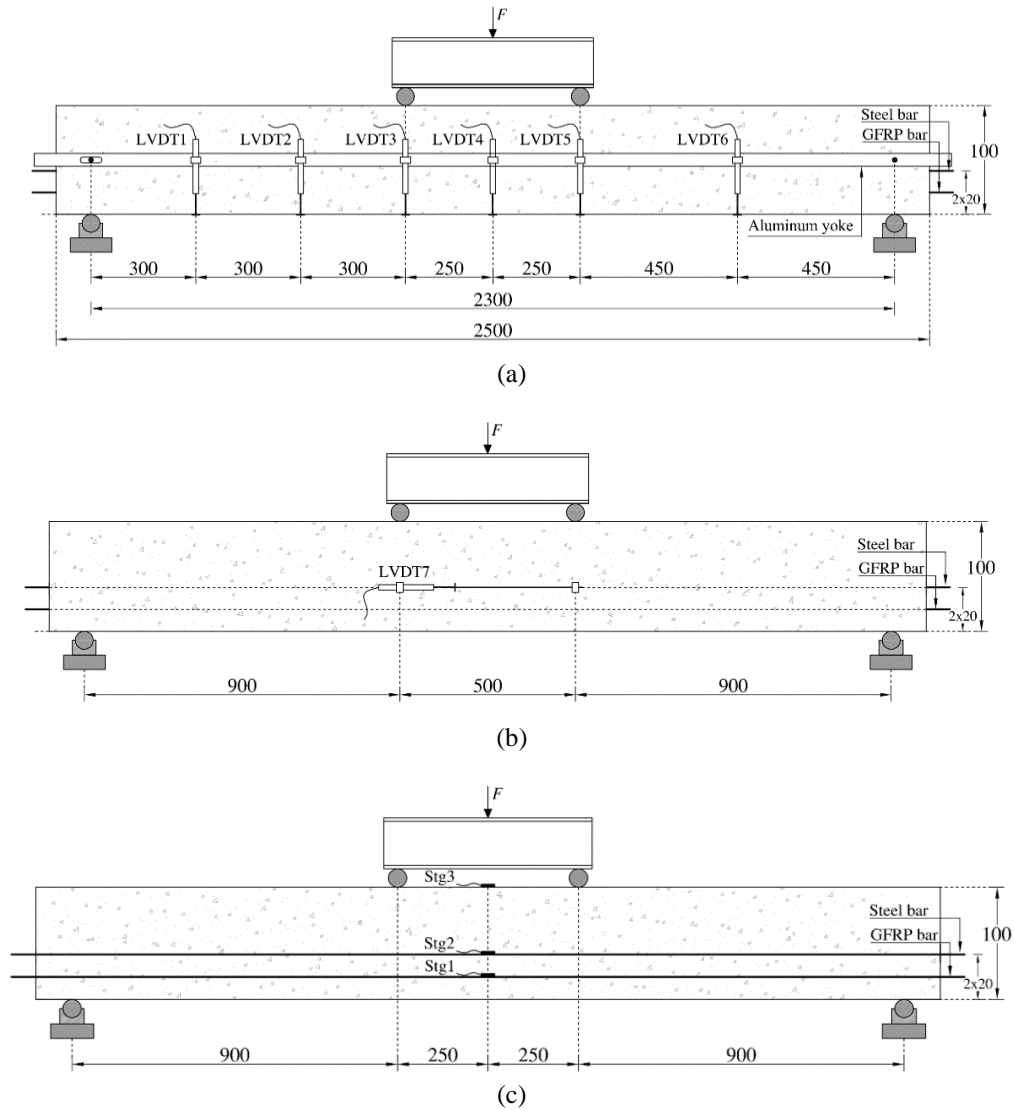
Four-point bending test setup; the position of (a) vertical LVDTs, (b) horizontal LVDT, and (c) strain gages (dimensions in mm)
